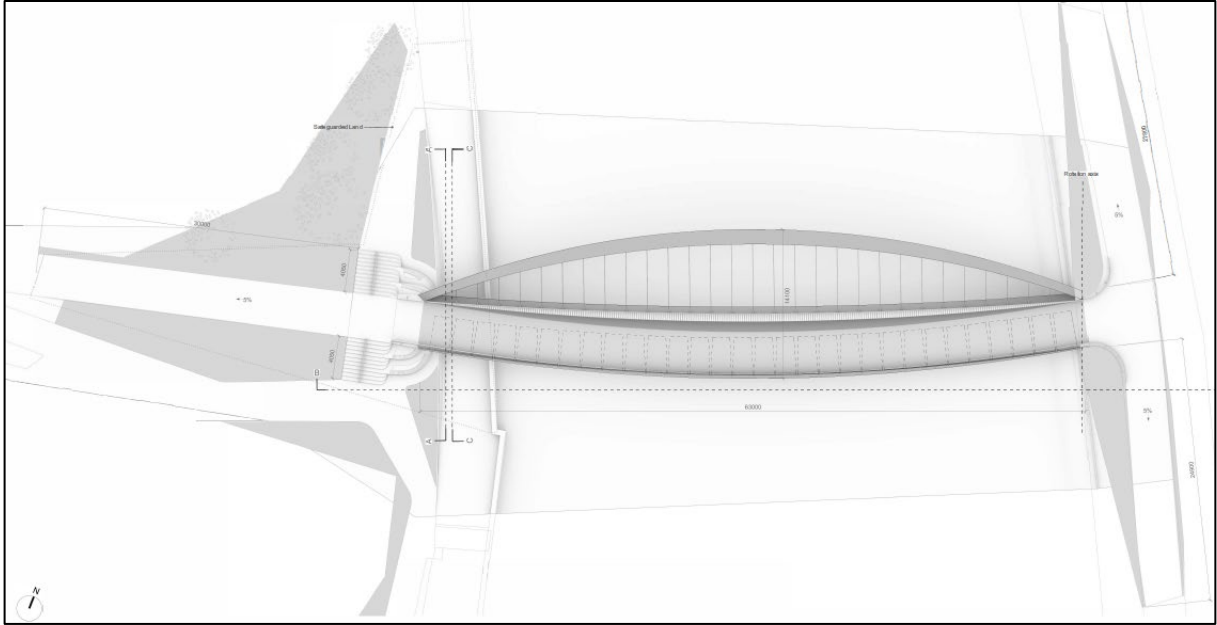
Drawing showing aerial view of the bridge and the bridge's west landing.
